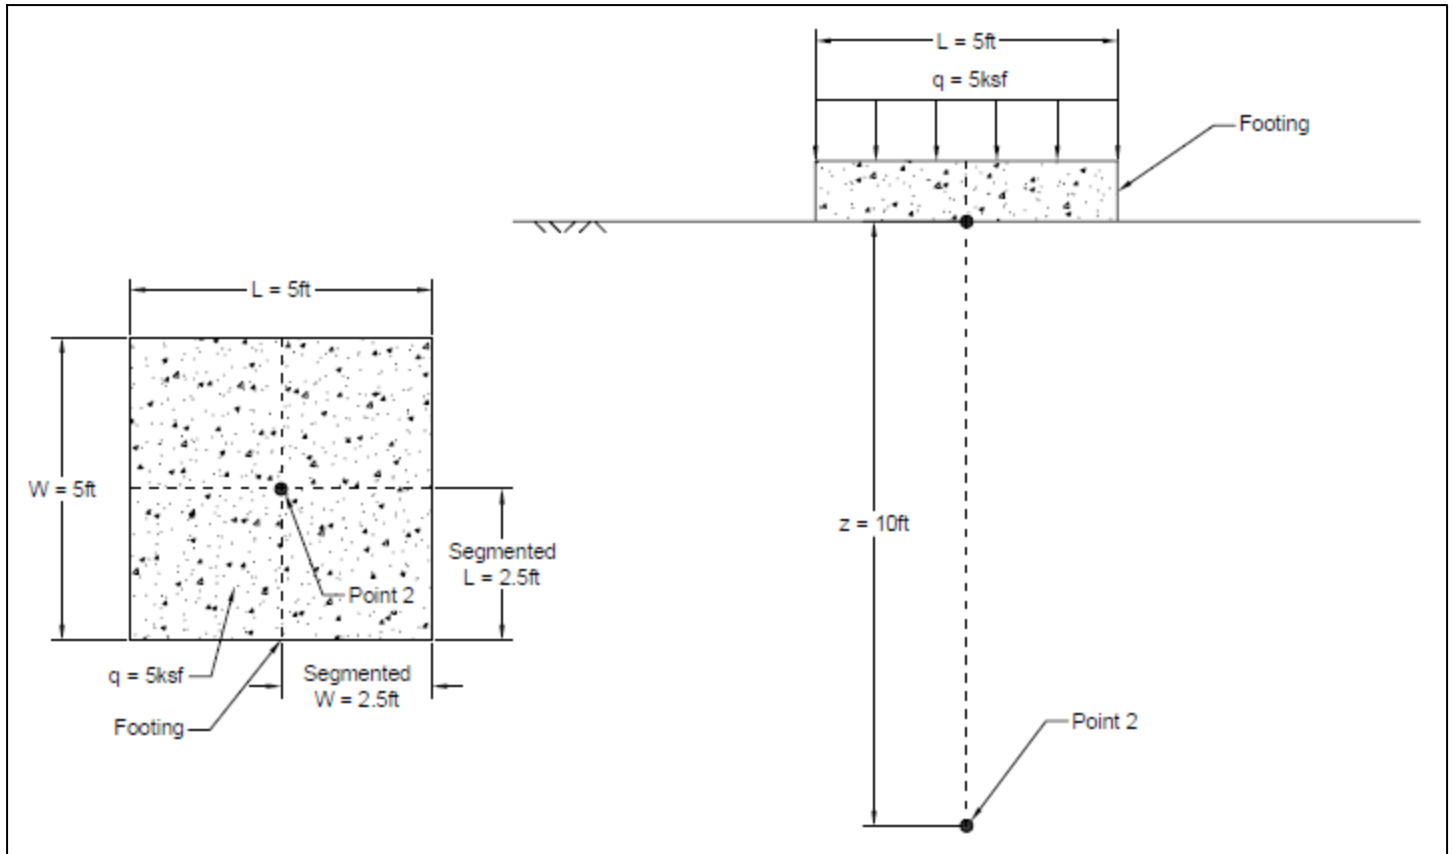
Stress Beneath Center of Square Footing Diagram (Left - Plan View, Right - Cross Section)
